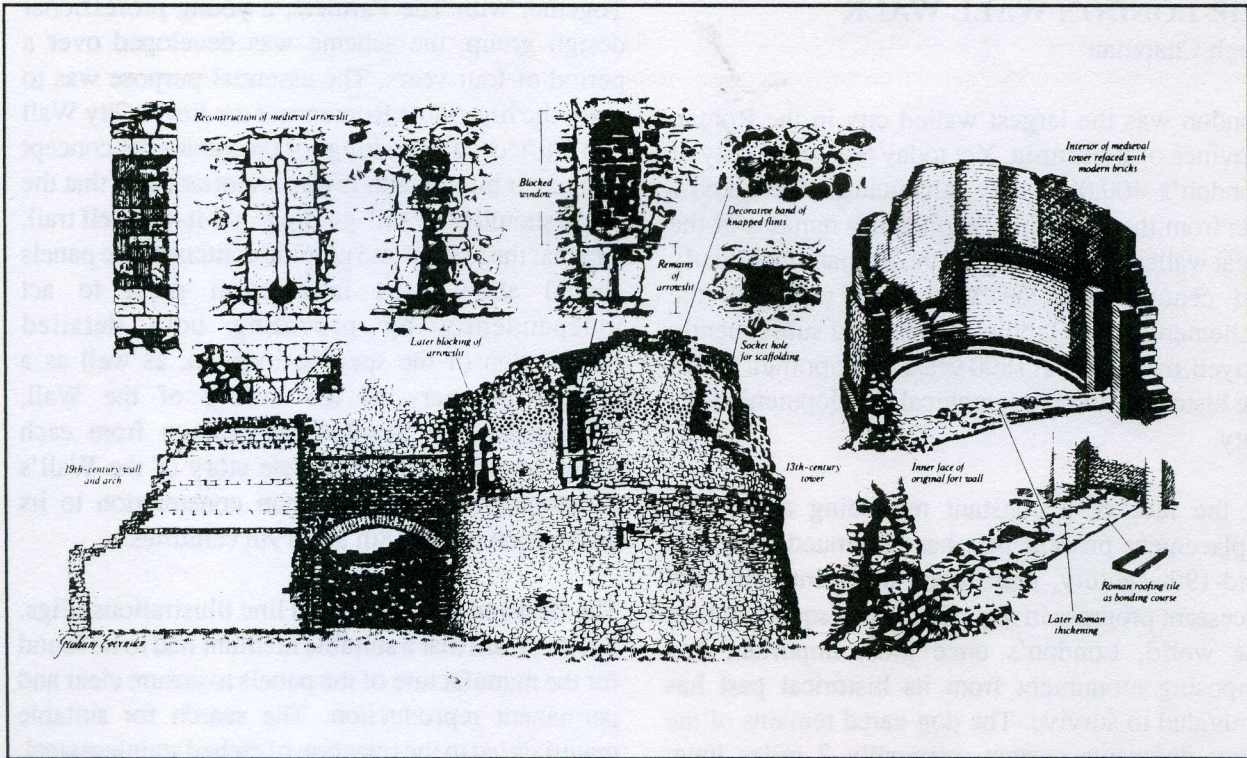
The London Wall Walk: Architectural details of the medieval bastion and remains of the City Wall for Panel 17 in museum gardens, London Wall. Drawn by Graham Evernden.
